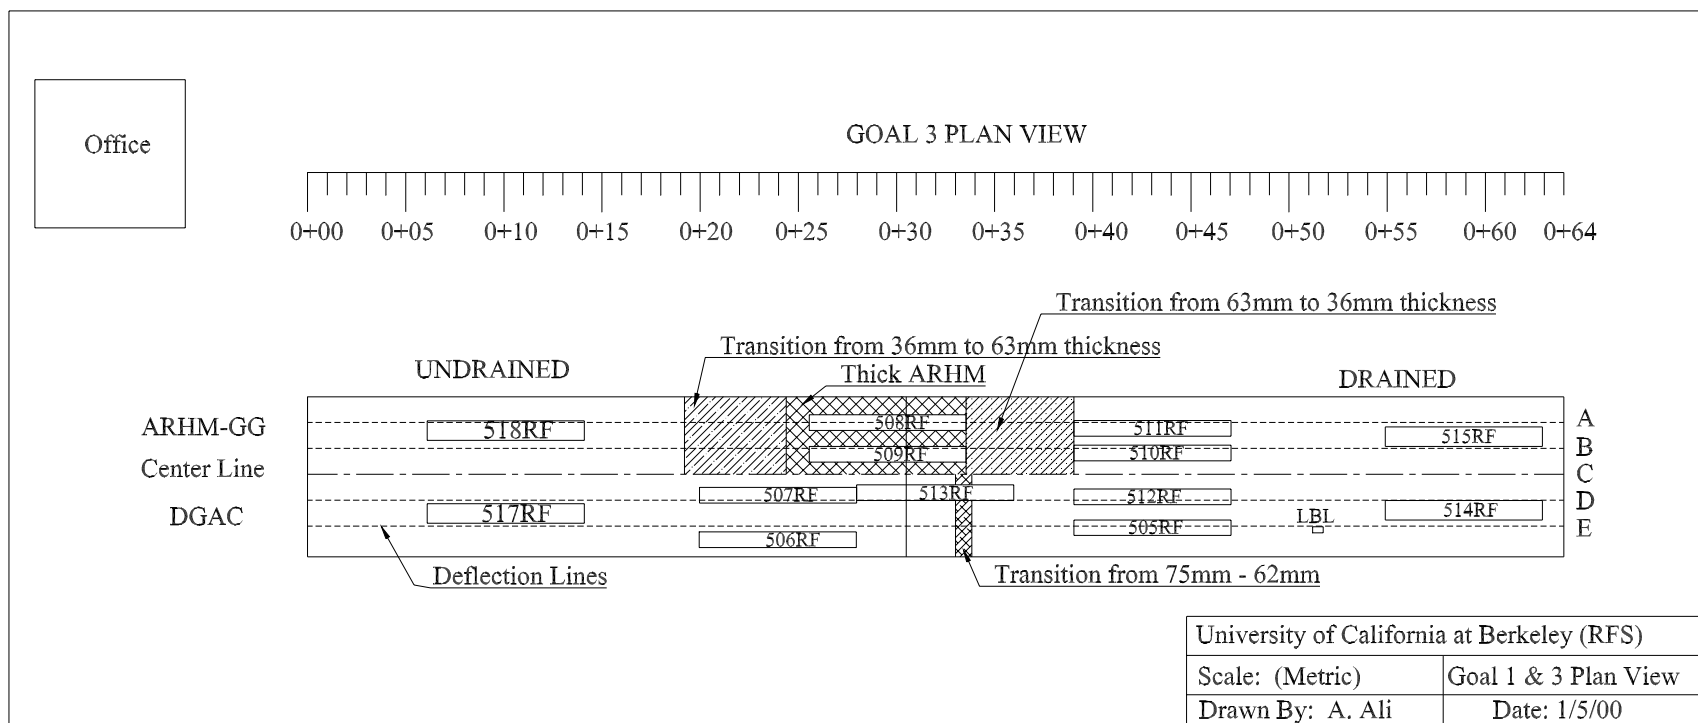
Layout of Goal 3 HVS tests sections—Section 514.
